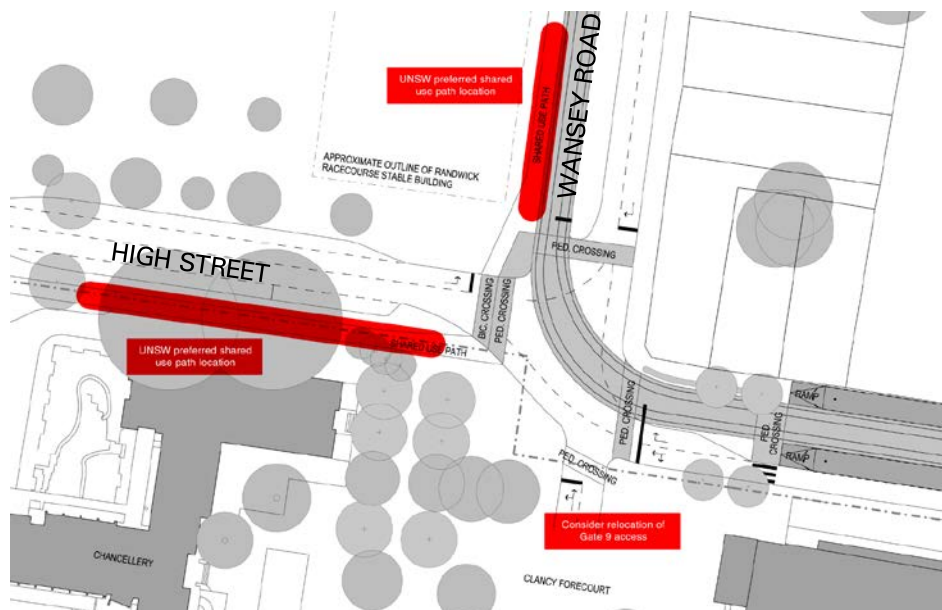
UNSW High Street Stop – Critical Constraints to be addressed
